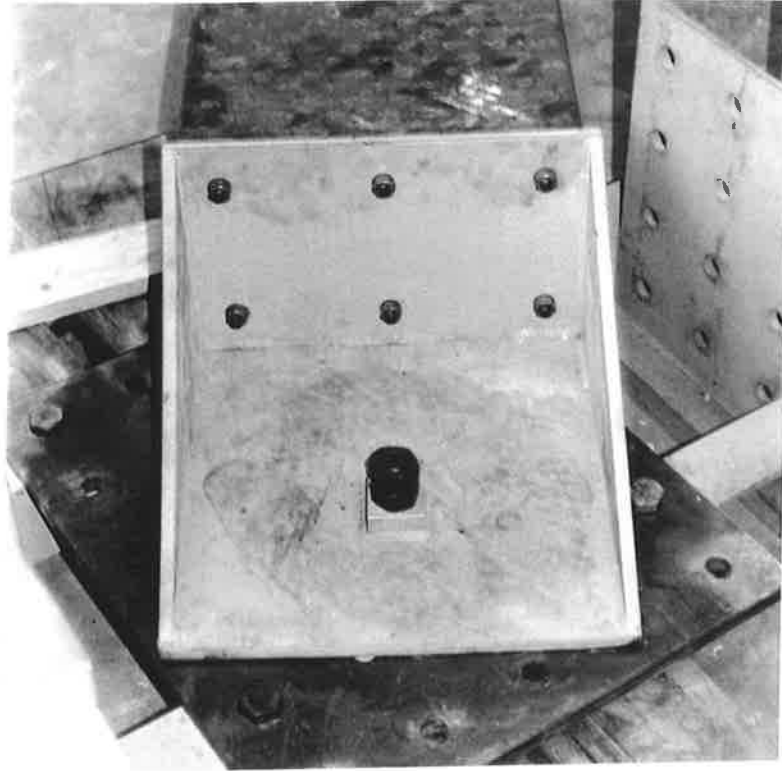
Pivot connection that connects to the rafter end & truss system
